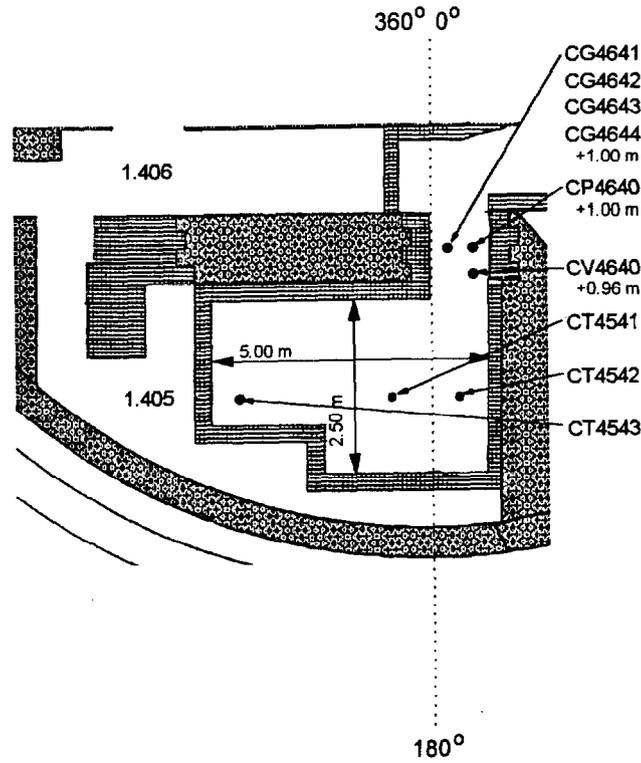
Fire Room at the +1.7 m Elevation for T51.2
